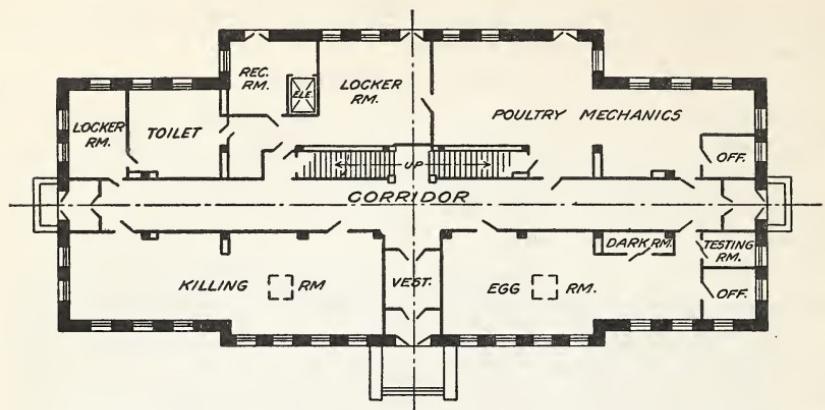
First-floor plan, poultry husbandry building, Cornell University.
